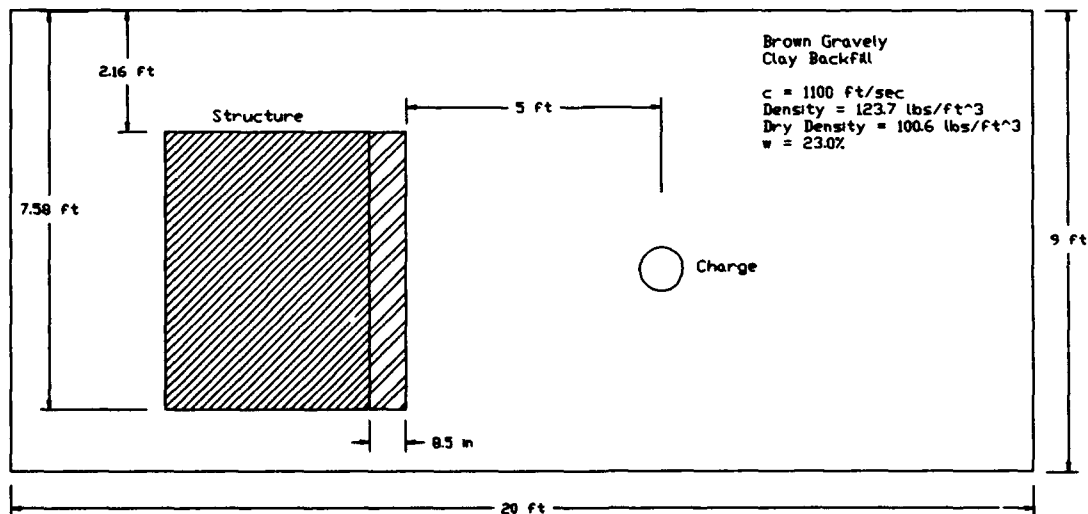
Section through CONWEB 2 test bed, showing backfill properties.
